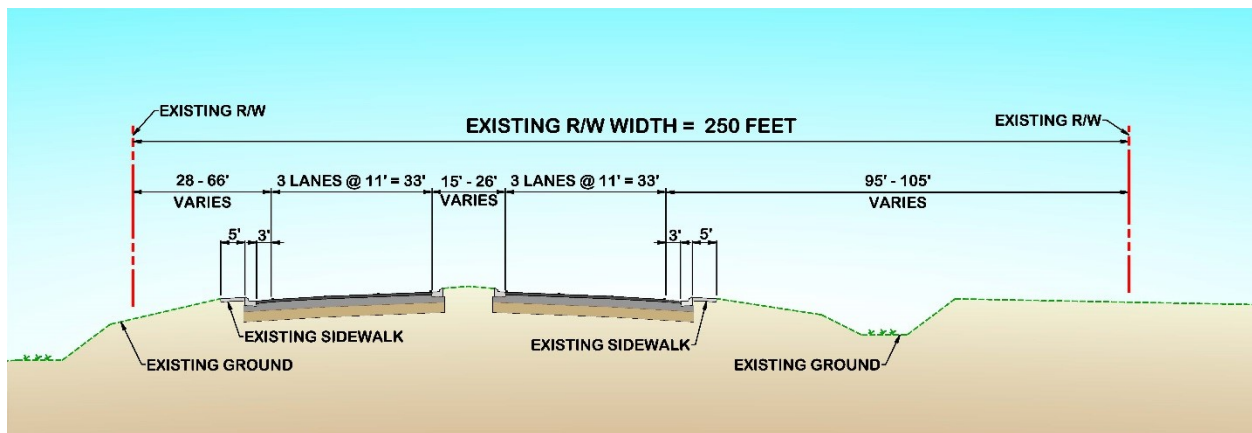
Existing SW 10<sup>th</sup> Street Typical Section – Military Trail to East Newport Center Drive
